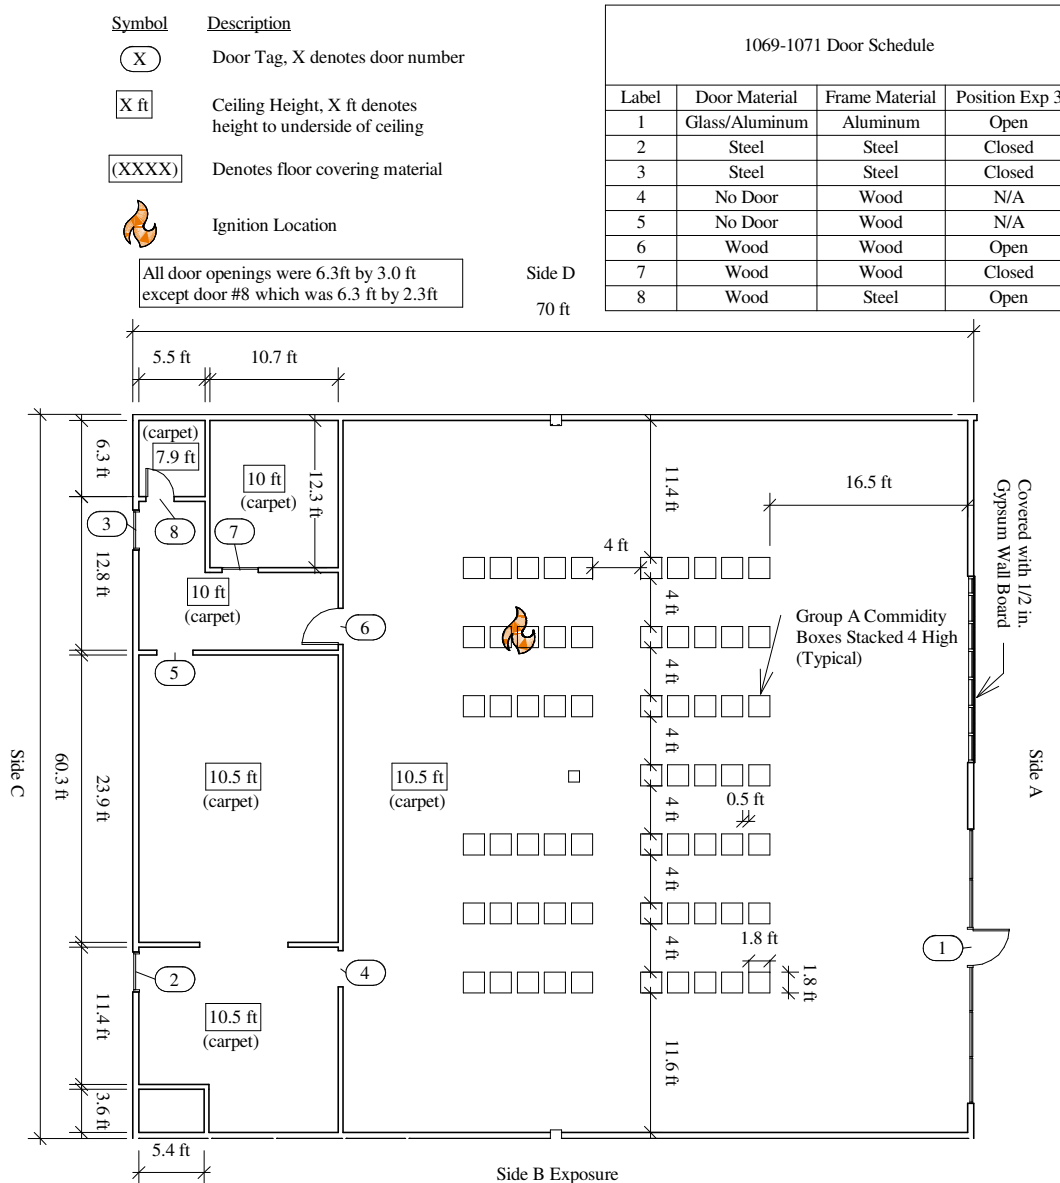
Floor plan of unit 1069–1071 utilized for Experiment 4.
